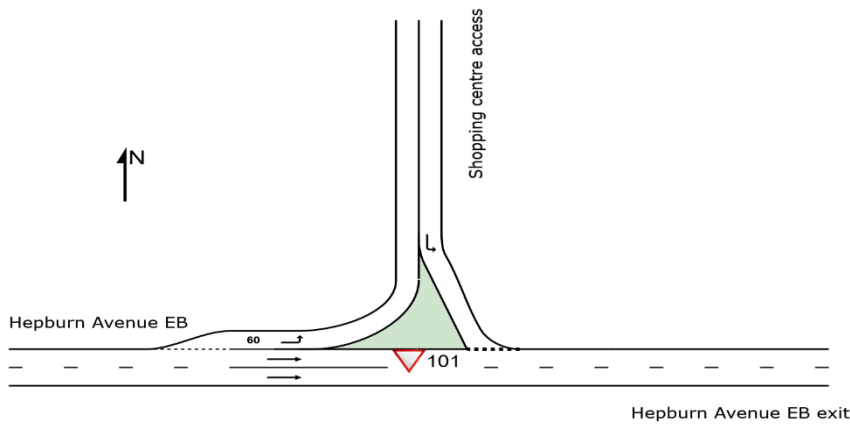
Hepburn Avenue / Kingsway west access - layout
